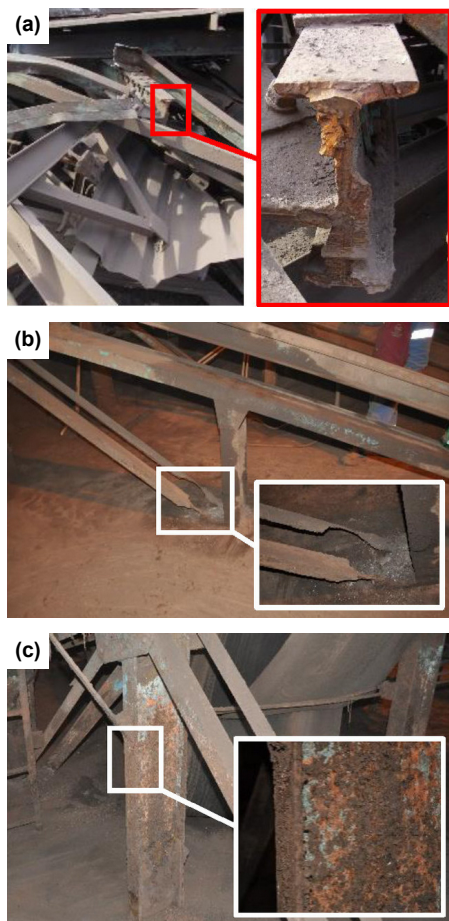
Details of the fractured element of the lower truss of the ICB structure (a), diagonal segment (b) and the column (c) of the load bearing structure of the belt conveyor drive station at the transfer point 4.
